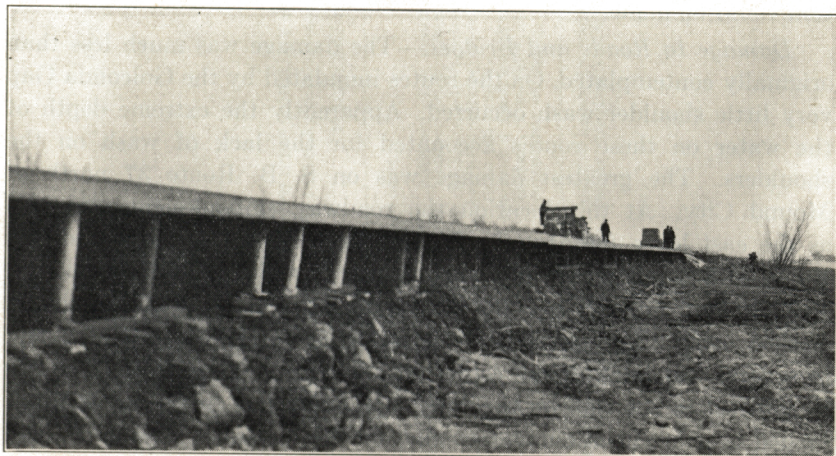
LOOKING SOUTH TOWARD MOUND CITY ON ROUTE 37, SHOWING METHOD OF SHORING UNDERCUT SLAB TO PREVENT FURTHER FAILURE
